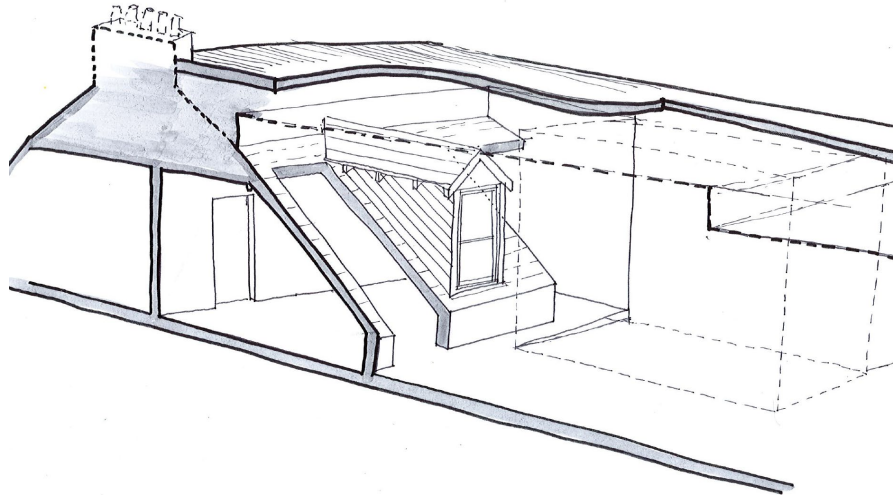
Sketch shows how the original dormer window will be retained within the new building.
